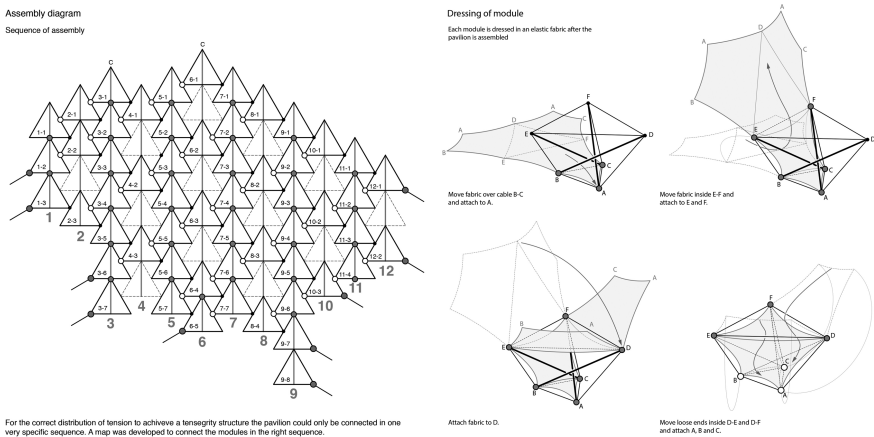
The two drawings necessary to assemble the Underwood Pavilion
